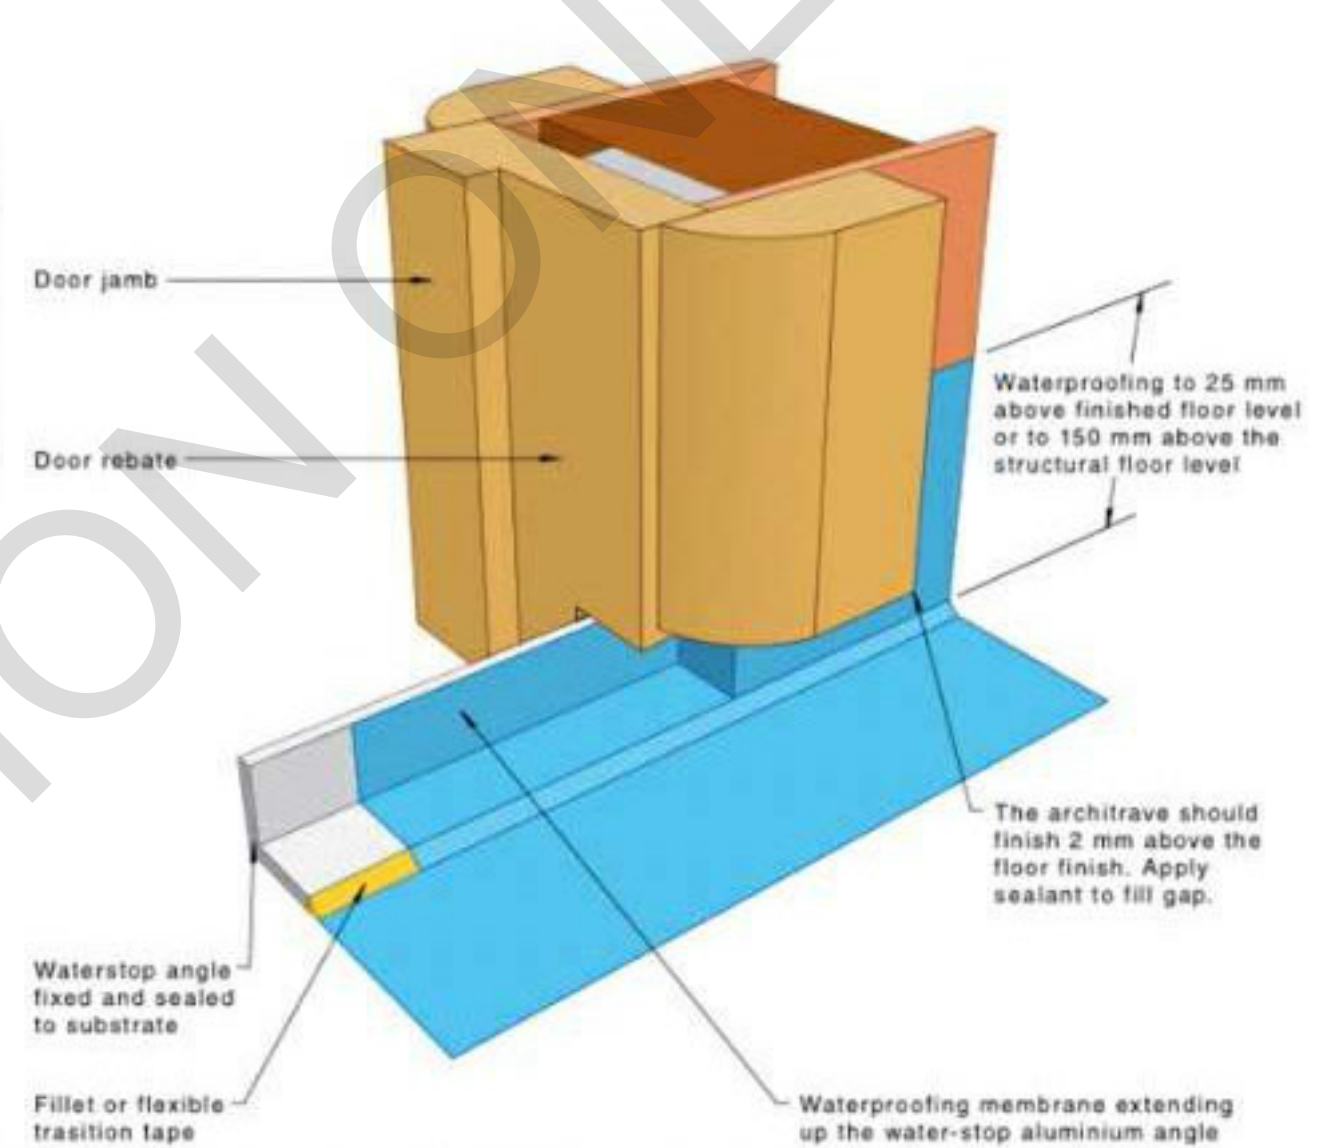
(B) — Waterproofing at door opening cavity slider
